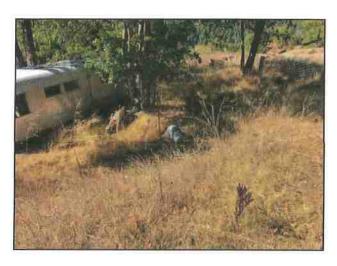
Mad River Medicianals Private Access Rd Looking @ 18" Culvert Out
